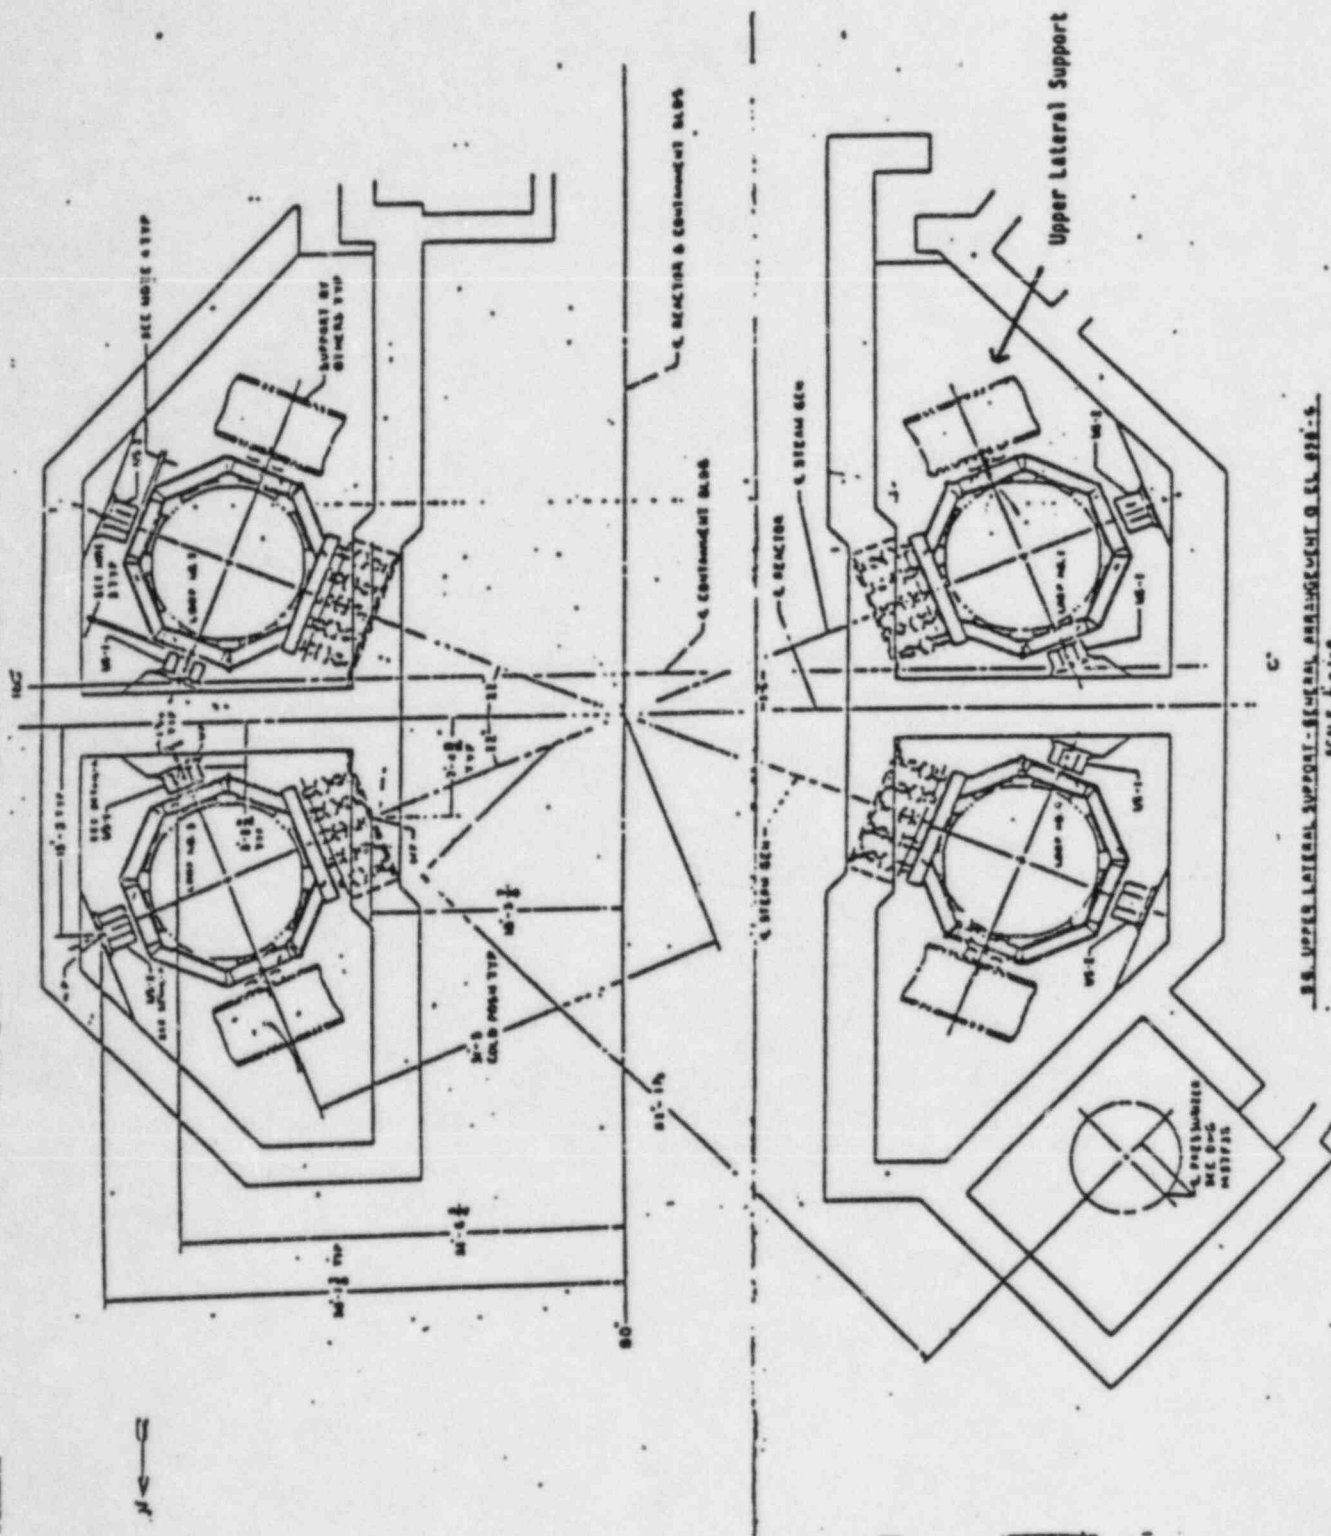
Plan Detail of Steam Generator Cavities With Supports.
